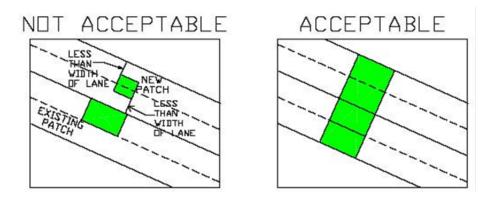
Example 3: Do not leave strips of pavement less than one-half lane in width.
